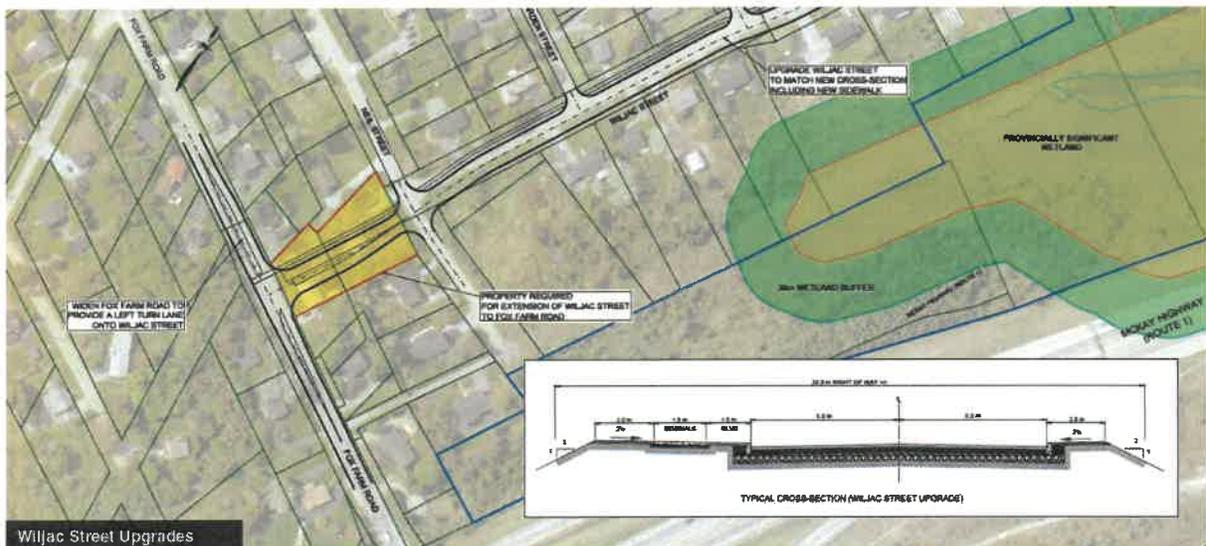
Detail of Wiljac Street Extension to Fox Farm Road and Preliminary Roadway Cross Section.
